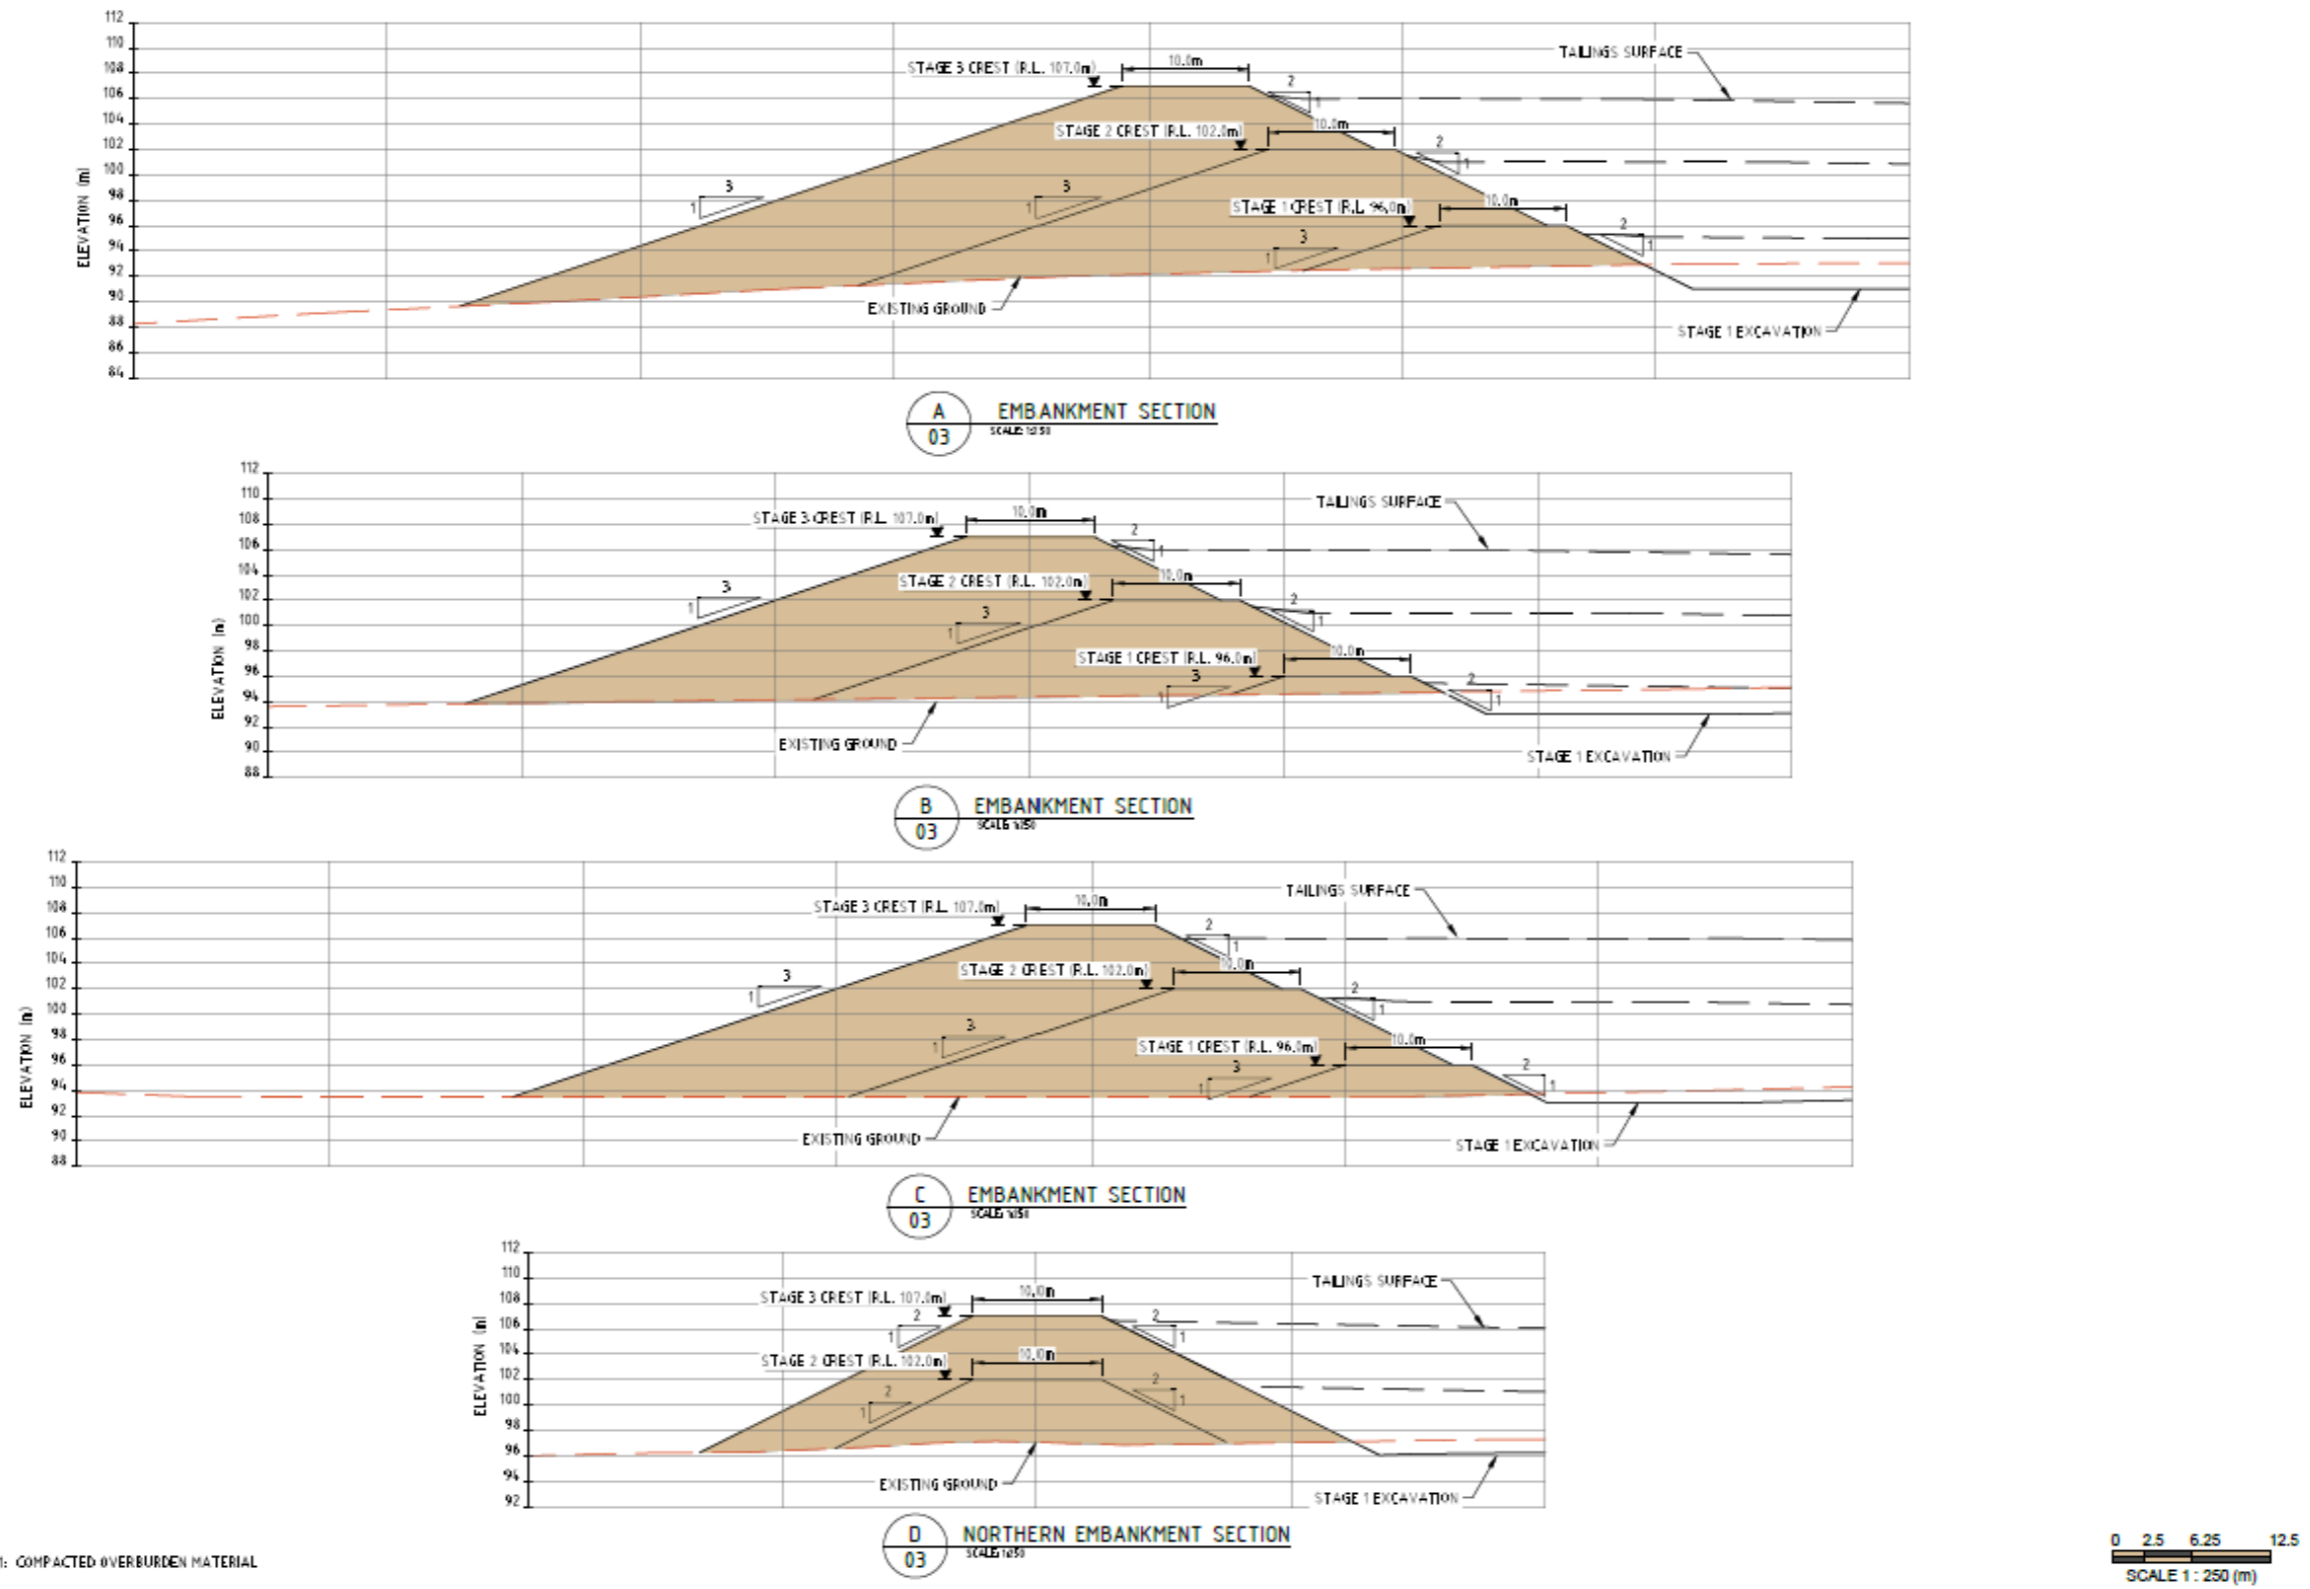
West Pit Extended IWLCF Stage 2 embankment design
